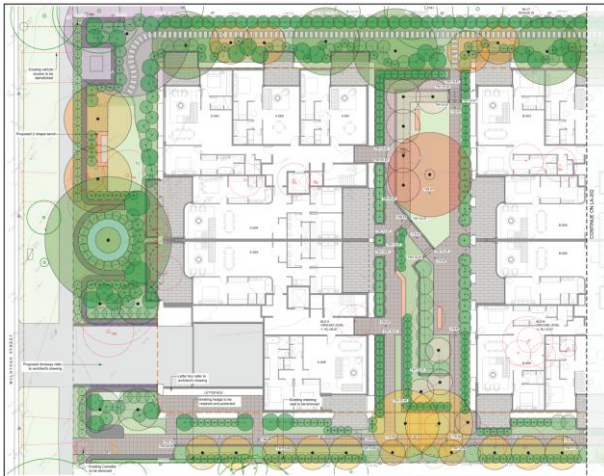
Previously proposed front landscape plans for Buildings A & B (Studio IZ)
